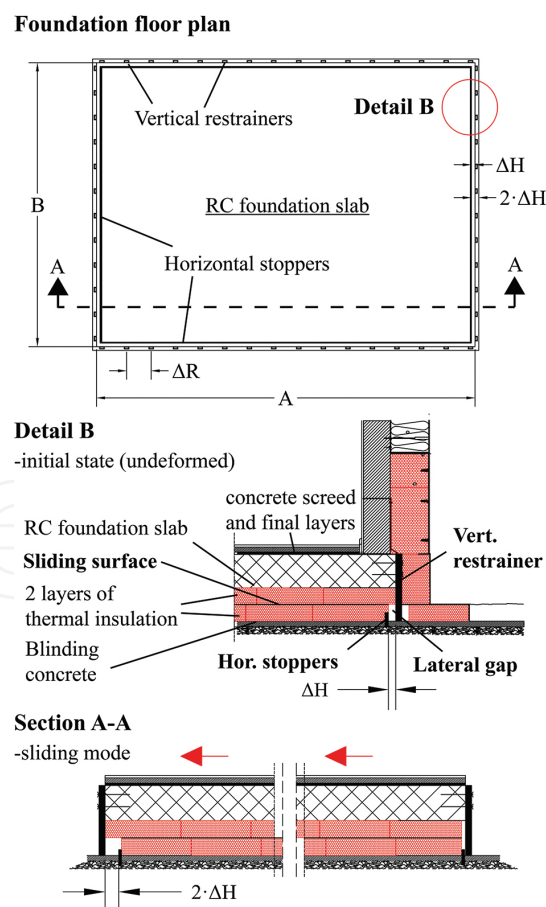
Section A-A and the foundation slab layout with the included anti-seismic sliding components.
